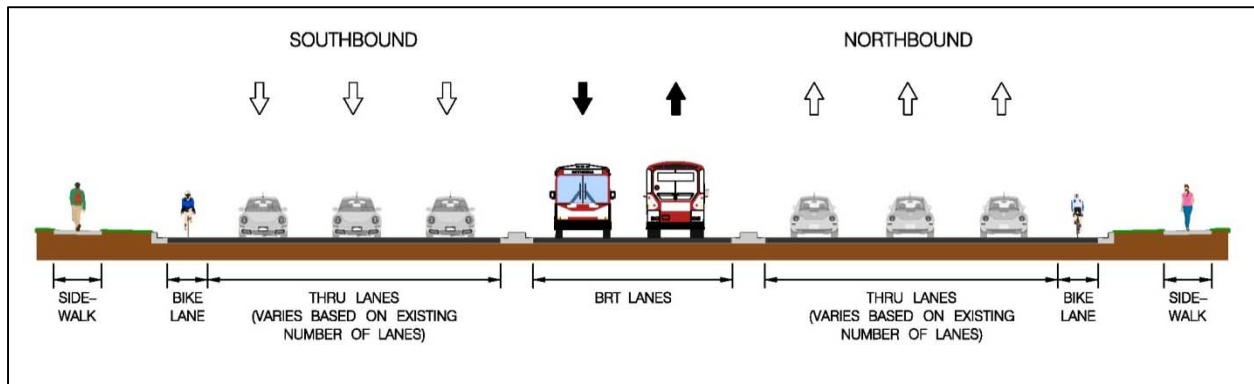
Alternative 3B - Section 1: Bethesda - AM Peak Period – Pooks Hill Road to Jones Bridge Road
